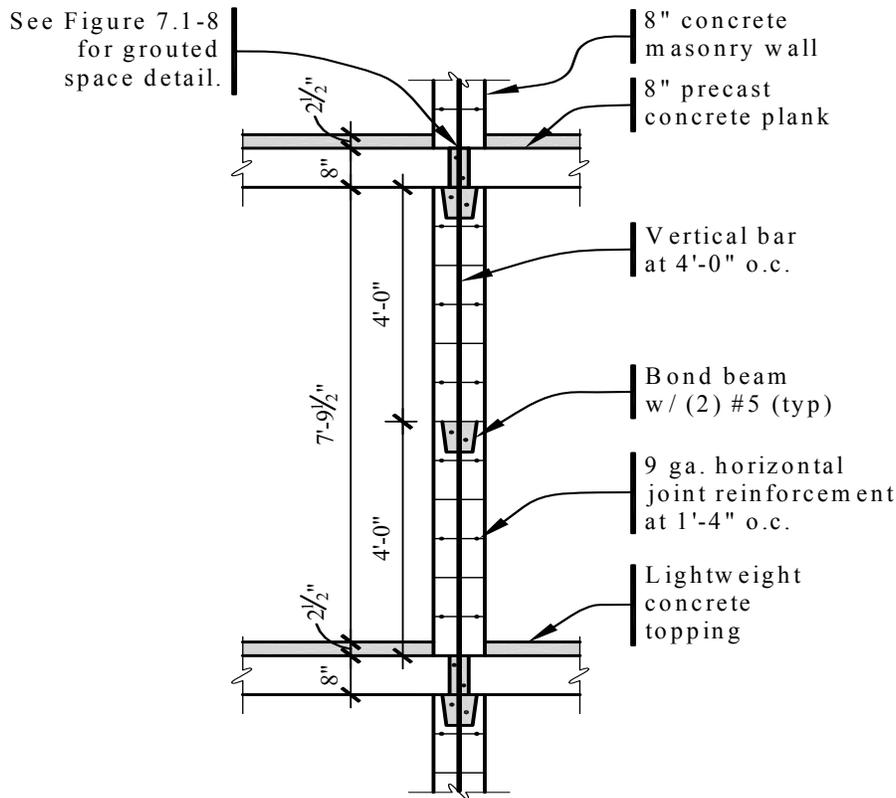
Typical wall section for the Los Angeles location (1.0 in. = 25.4 mm, 1.0 ft = 0.3048 m)
